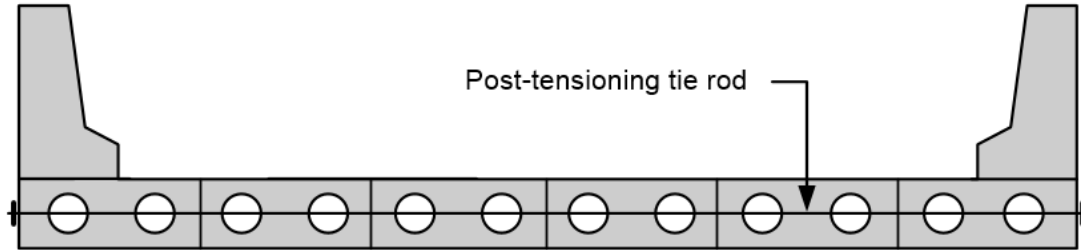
Cross Section - Precast Voided Slab Beam Bridge
